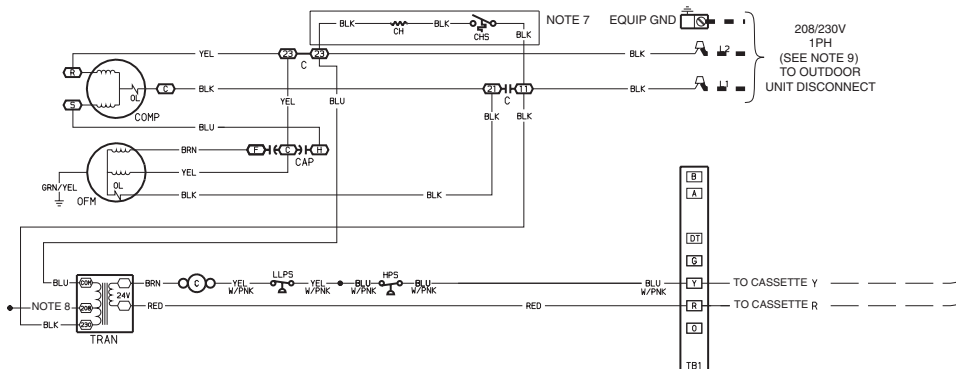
619FNQ Unit Matched to 538QNF Outdoor Unit — Wiring Connection (Heat Pump System)
